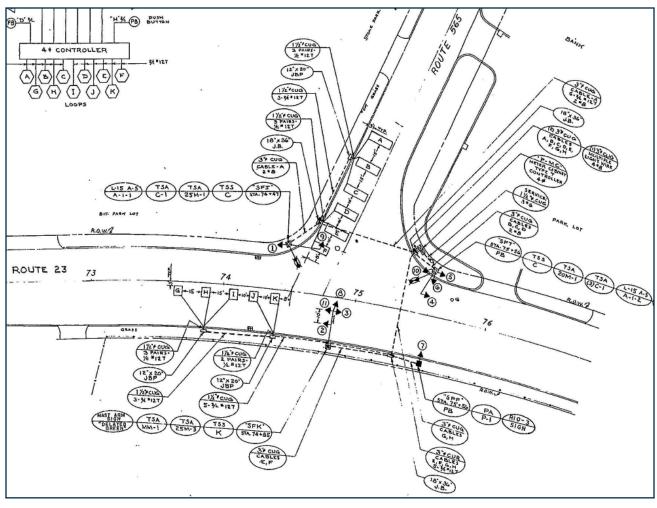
Route 23 and Route 565 intersection signal and lighting plan.
